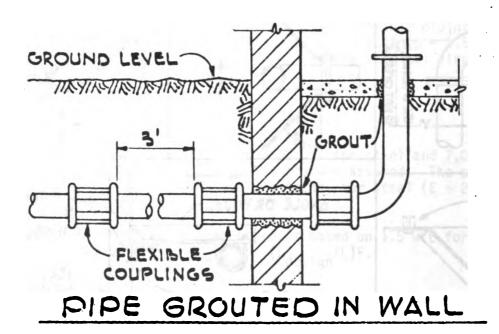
Acceptable Seismic Details for Piping Entering Building
